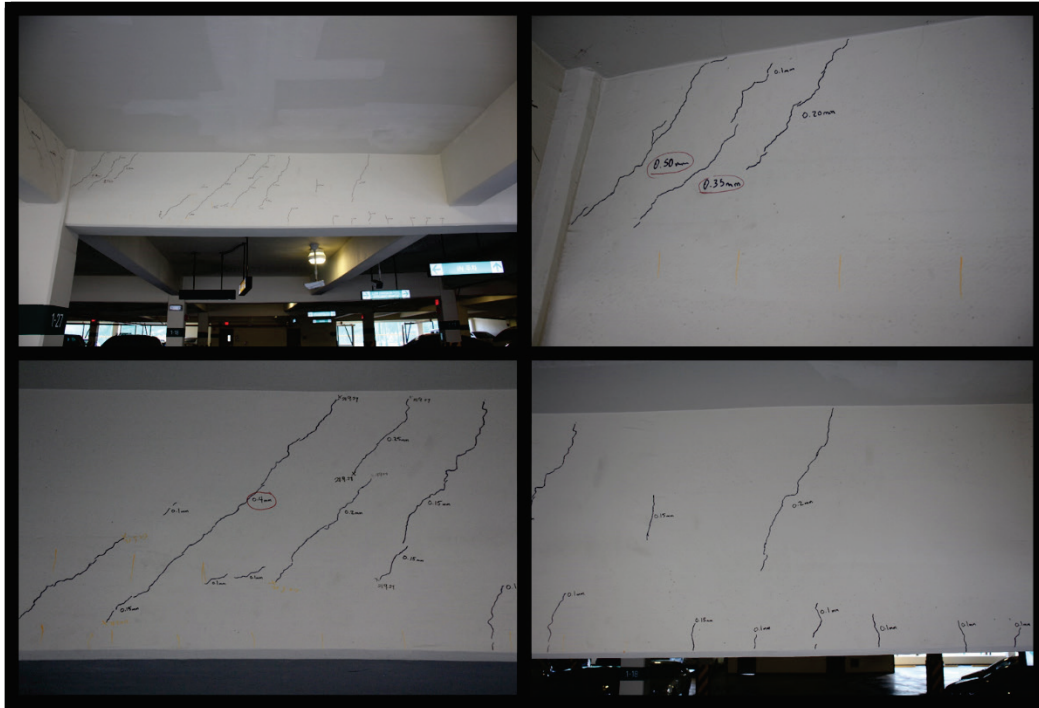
Removal of paint and top coating from girder and beam in Parking Garage 1. The girder is in line with column E, and the beam is in line with column 4 of the floor plan.
